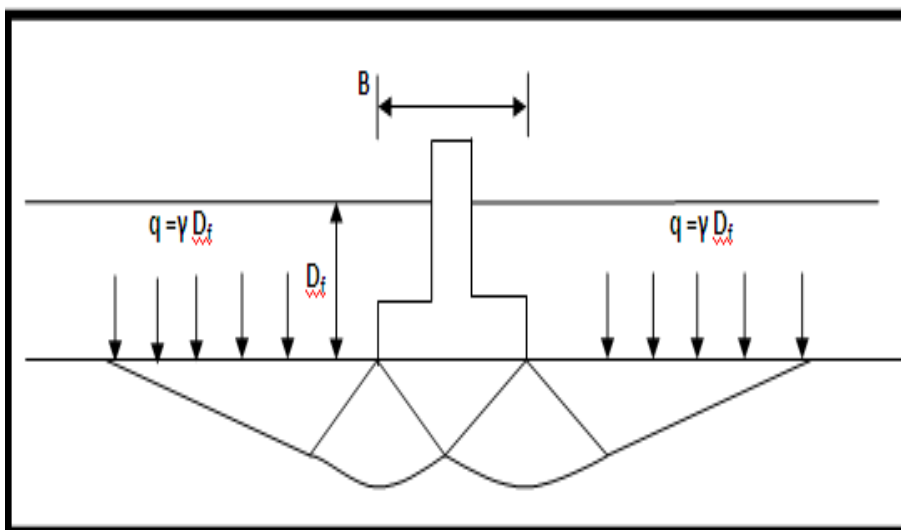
Bearing capacity failure mechanism for strip footing
